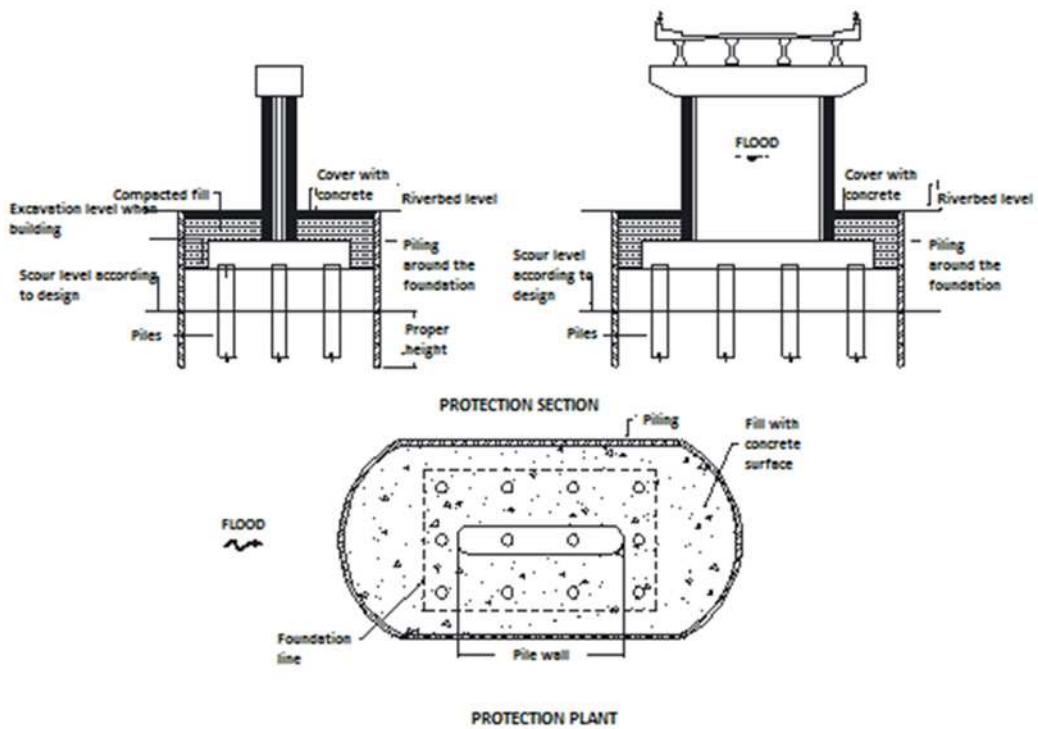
14 Local protection in piles using sheet piling. (SPOP, 2014)
